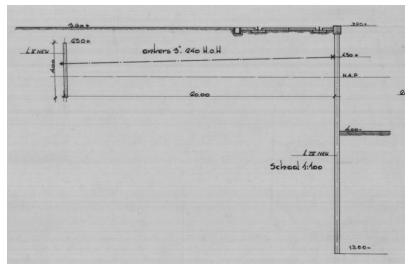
Cross-section of the current quay wall in the Sleepboothaven
